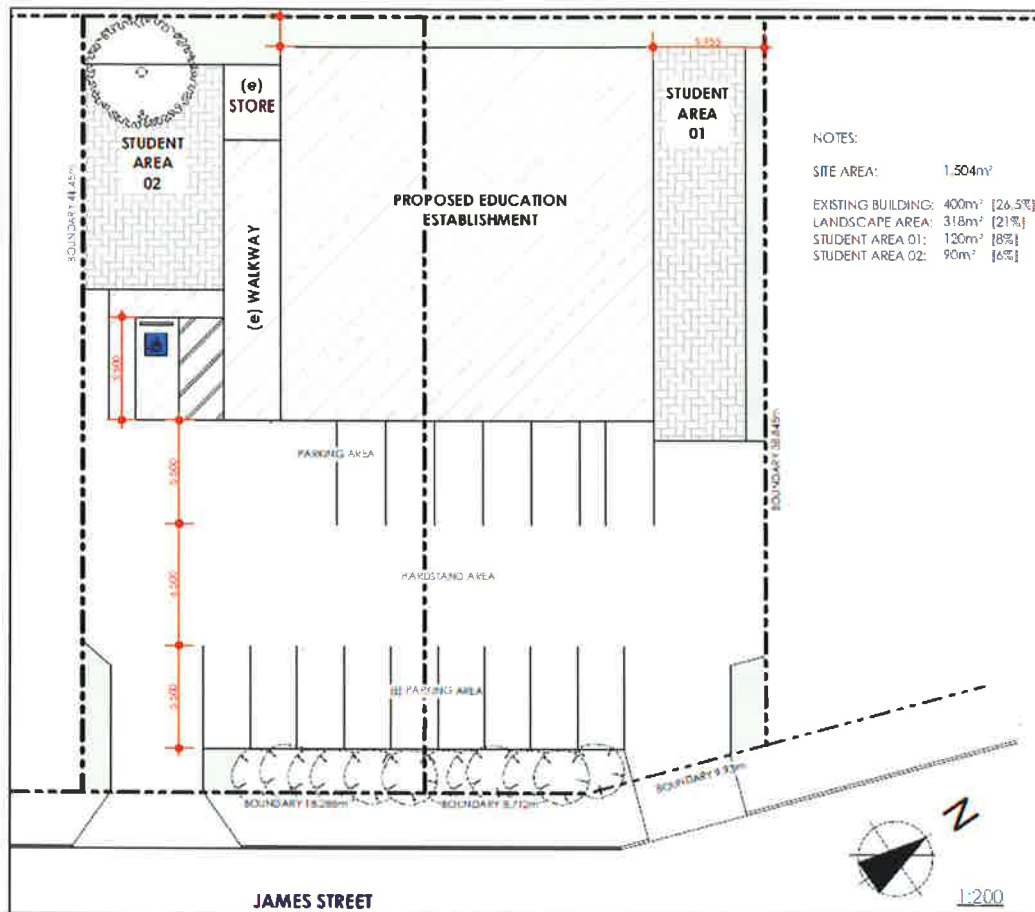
| Proposed external site layout (Source: Applicant's EIS)
